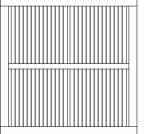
lathwork (oeyeokgi) as base for the plastering of a non-loadbearing wall
